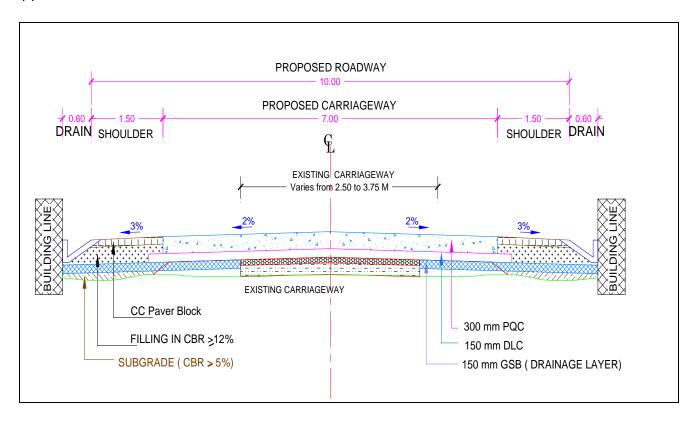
Typical Cross-section of CC Pavement in Built-up Areas
